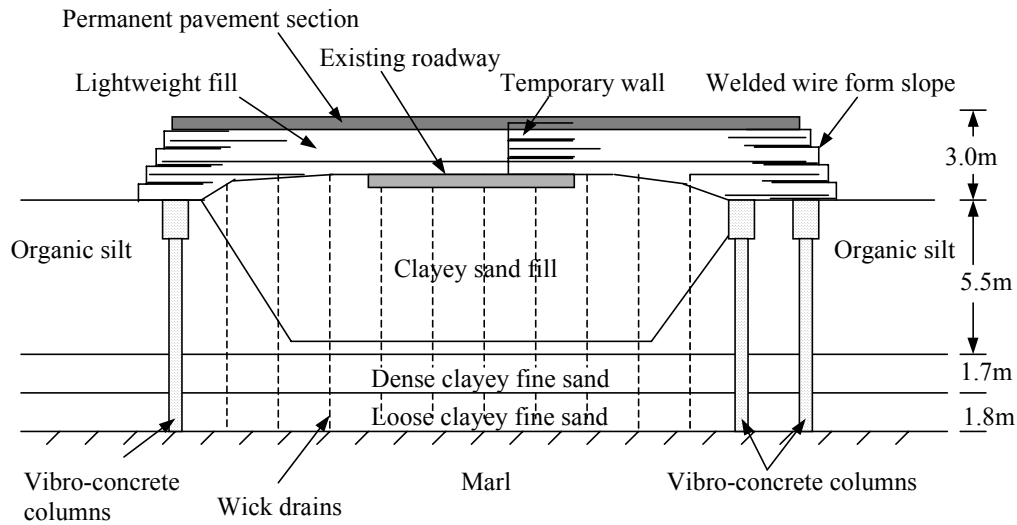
Typical Cross Section of SRWs on the GRPS System (Alzamora et al., 2000)
